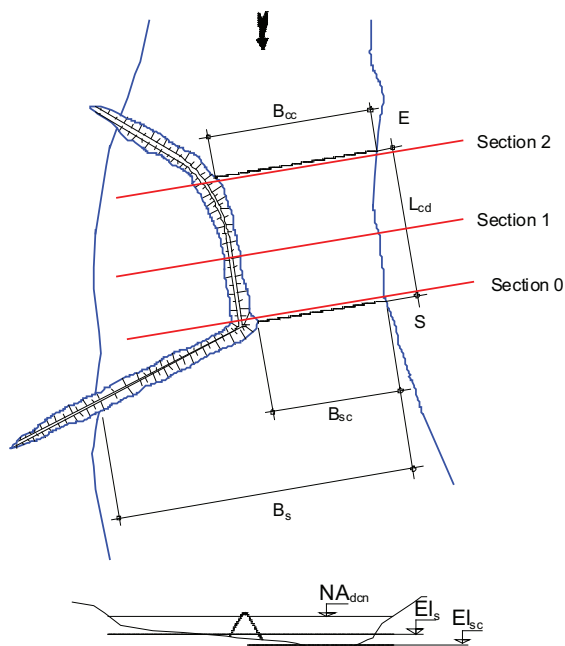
Typical plan and cross-section of a diversion channel.
